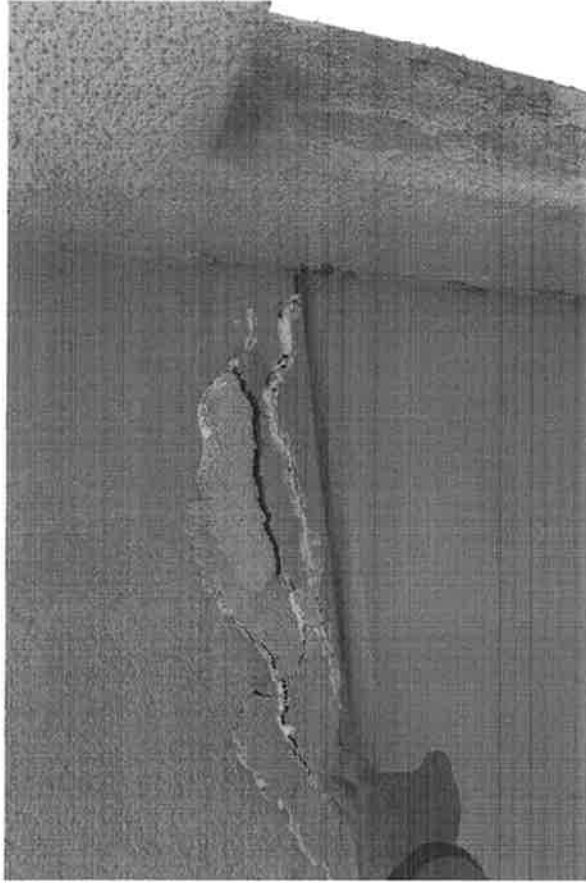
Close up view of isolated spalling at railing connection to hollow core concrete panel (typical)
